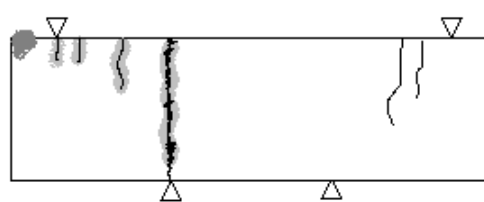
Typical failure modes and crack patterns for flexurally reinforced MBrace™ carbon beams.
